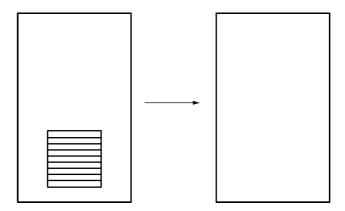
b) — Ventilation grilles (louvres) in door leaf — Remove
